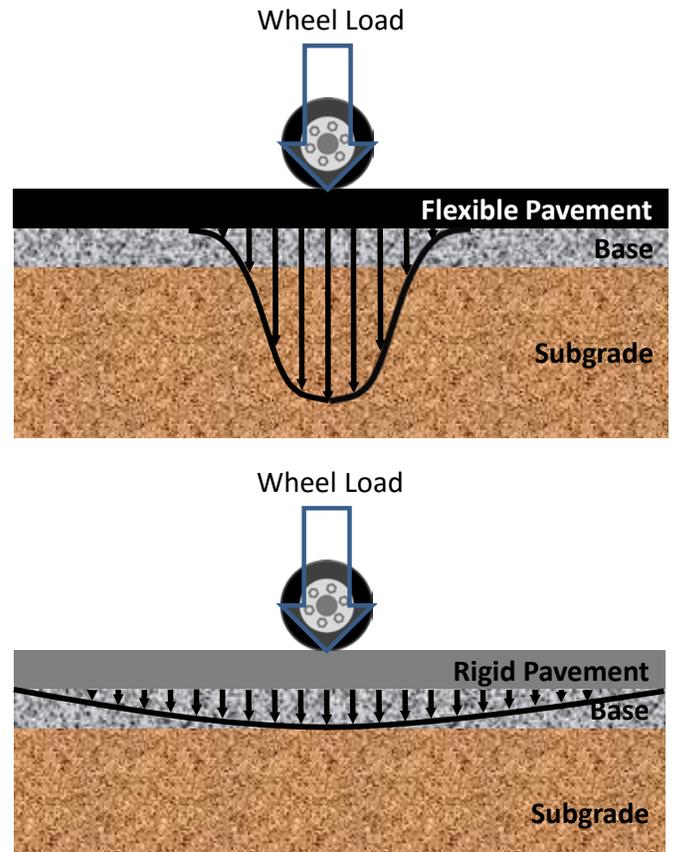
Illustrations. How rigid pavements and flexible pavements transfer applied loads to the layers beneath.
